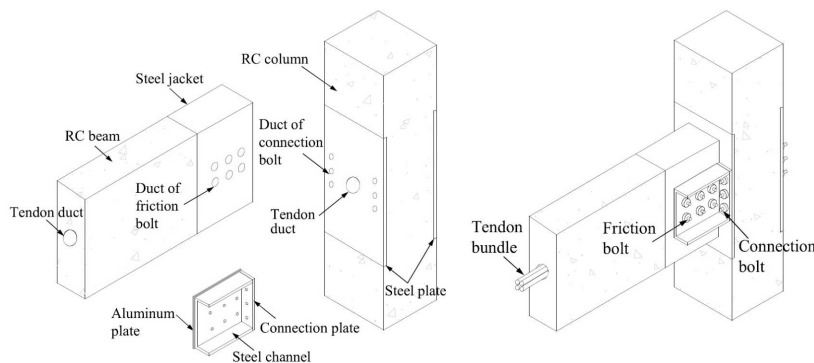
Connection with bolted WFD connection suggested by (Song et al., 2014).
